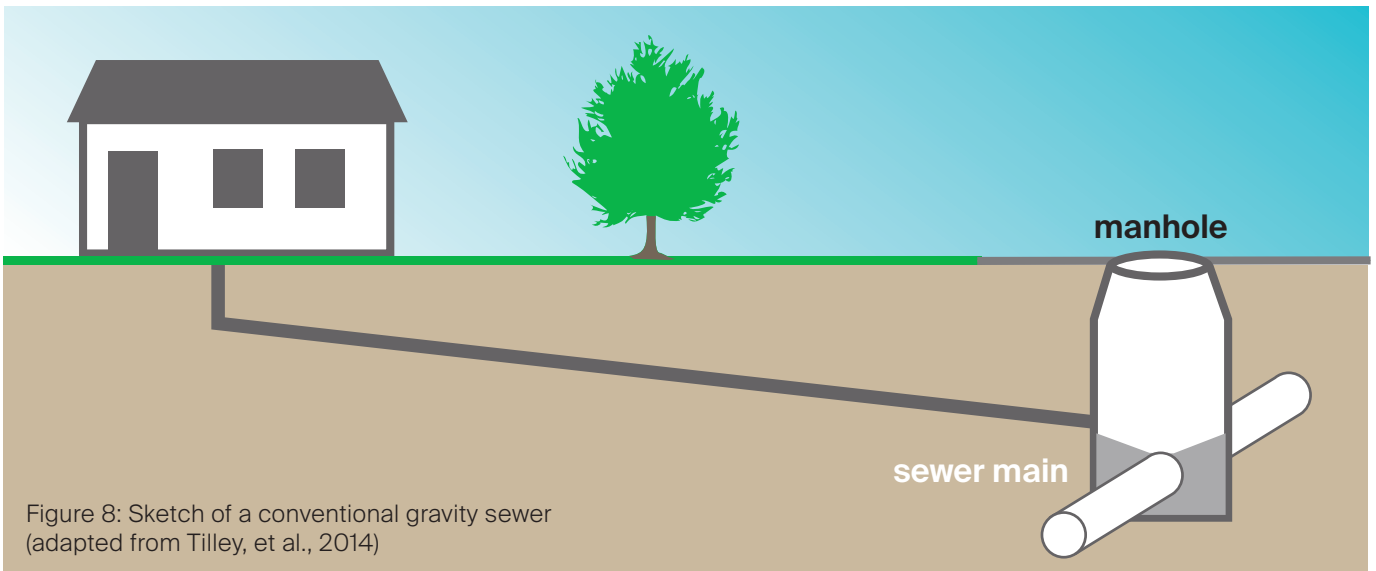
Sketch of a conventional gravity sewer (adapted from Tilley, et al., 2014)
